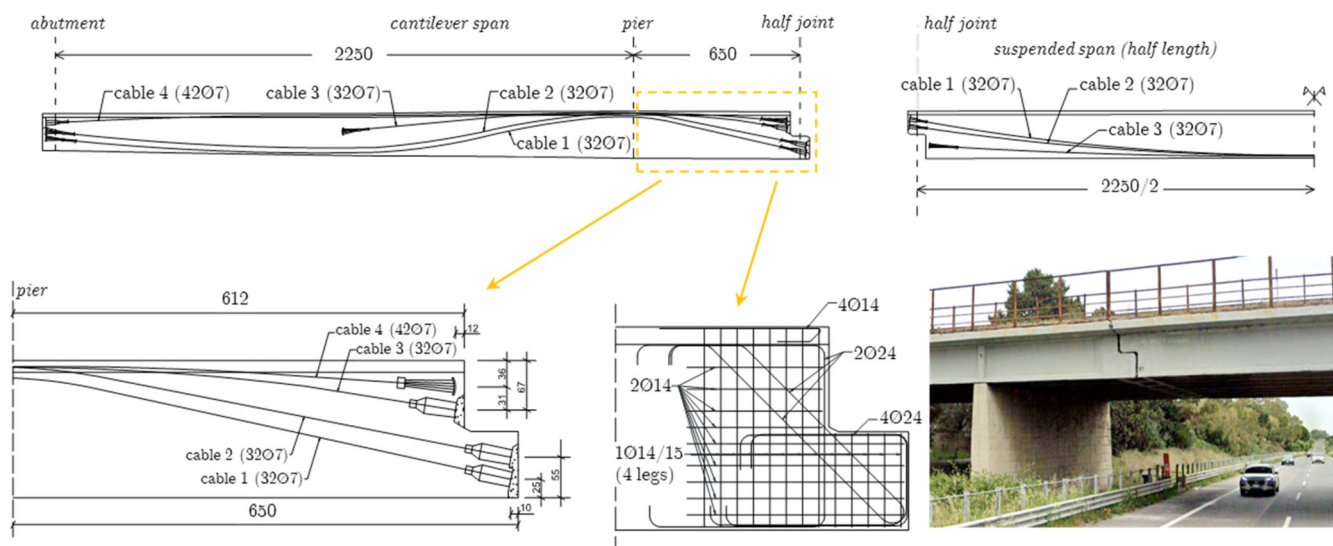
Prestressing cables profile and arrangement of longitudinal and transversal steel reinforcement bars in the Gerber half joint reproduced from original drawings, measures in (cm).
